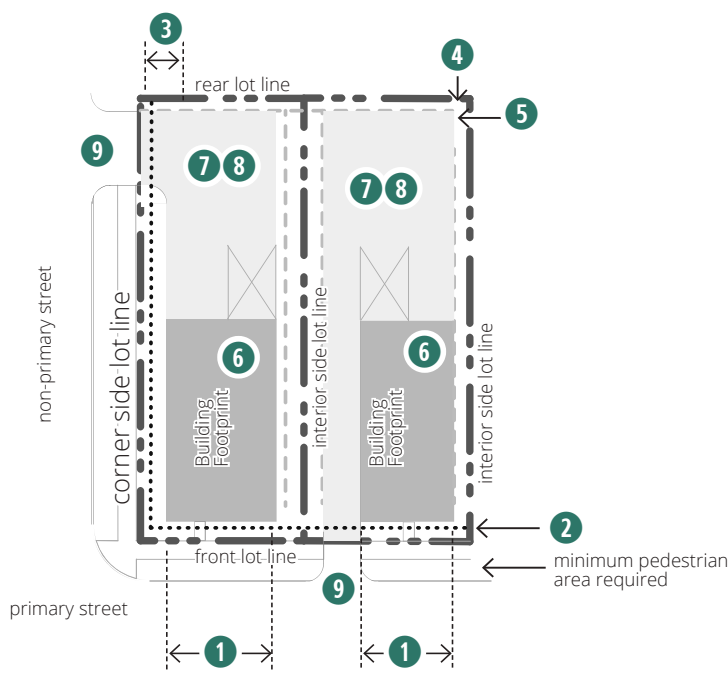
D-4. Commercial Manor Building: Building Siting
